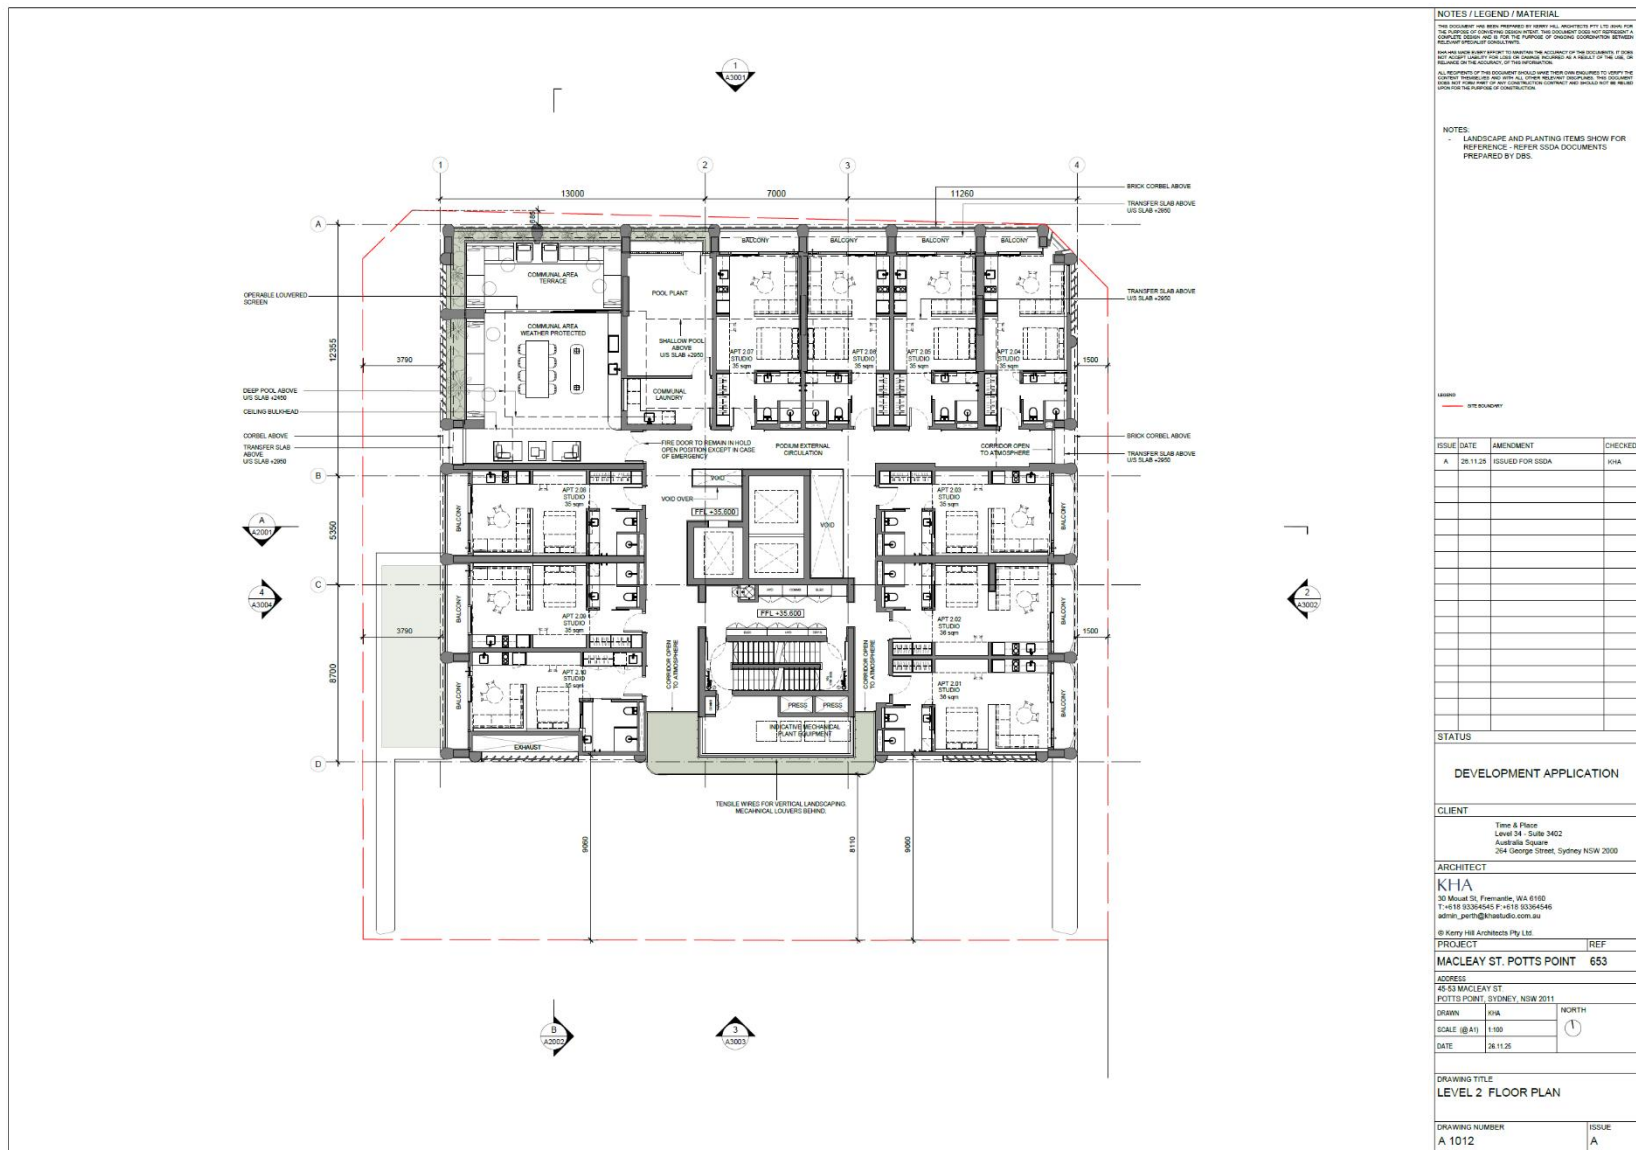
Level 2 floor plan (Kerry Hill Architects)
